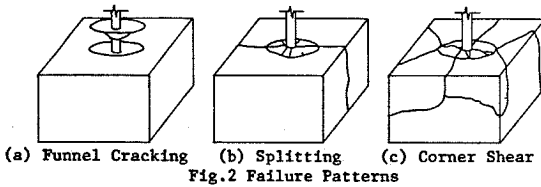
Anchorage test with reinforcing bars having only a single transverse rib from Nagatomo & Kaku [85.1].
